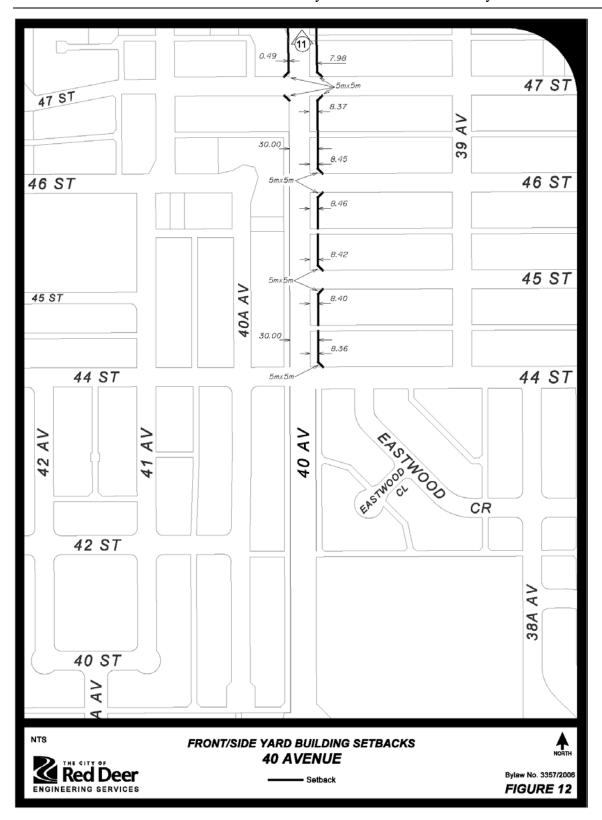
Front/Side Yard Building Setbacks 40 Avenue
